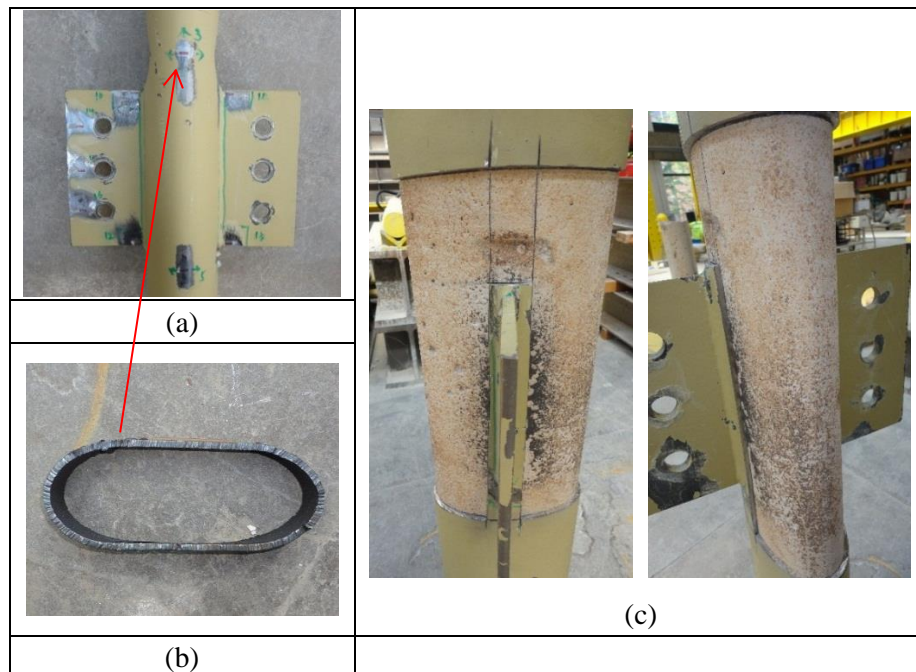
Failure of Type-C connections: (a) Joint-C; (b) Top cross-section of Joint-C column; (c) Core concrete of Joint-CC
